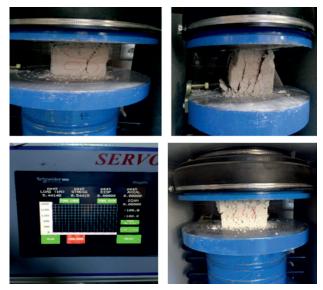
Tests conducted to determine compressive strength of ultra lightweight concrete specimens
